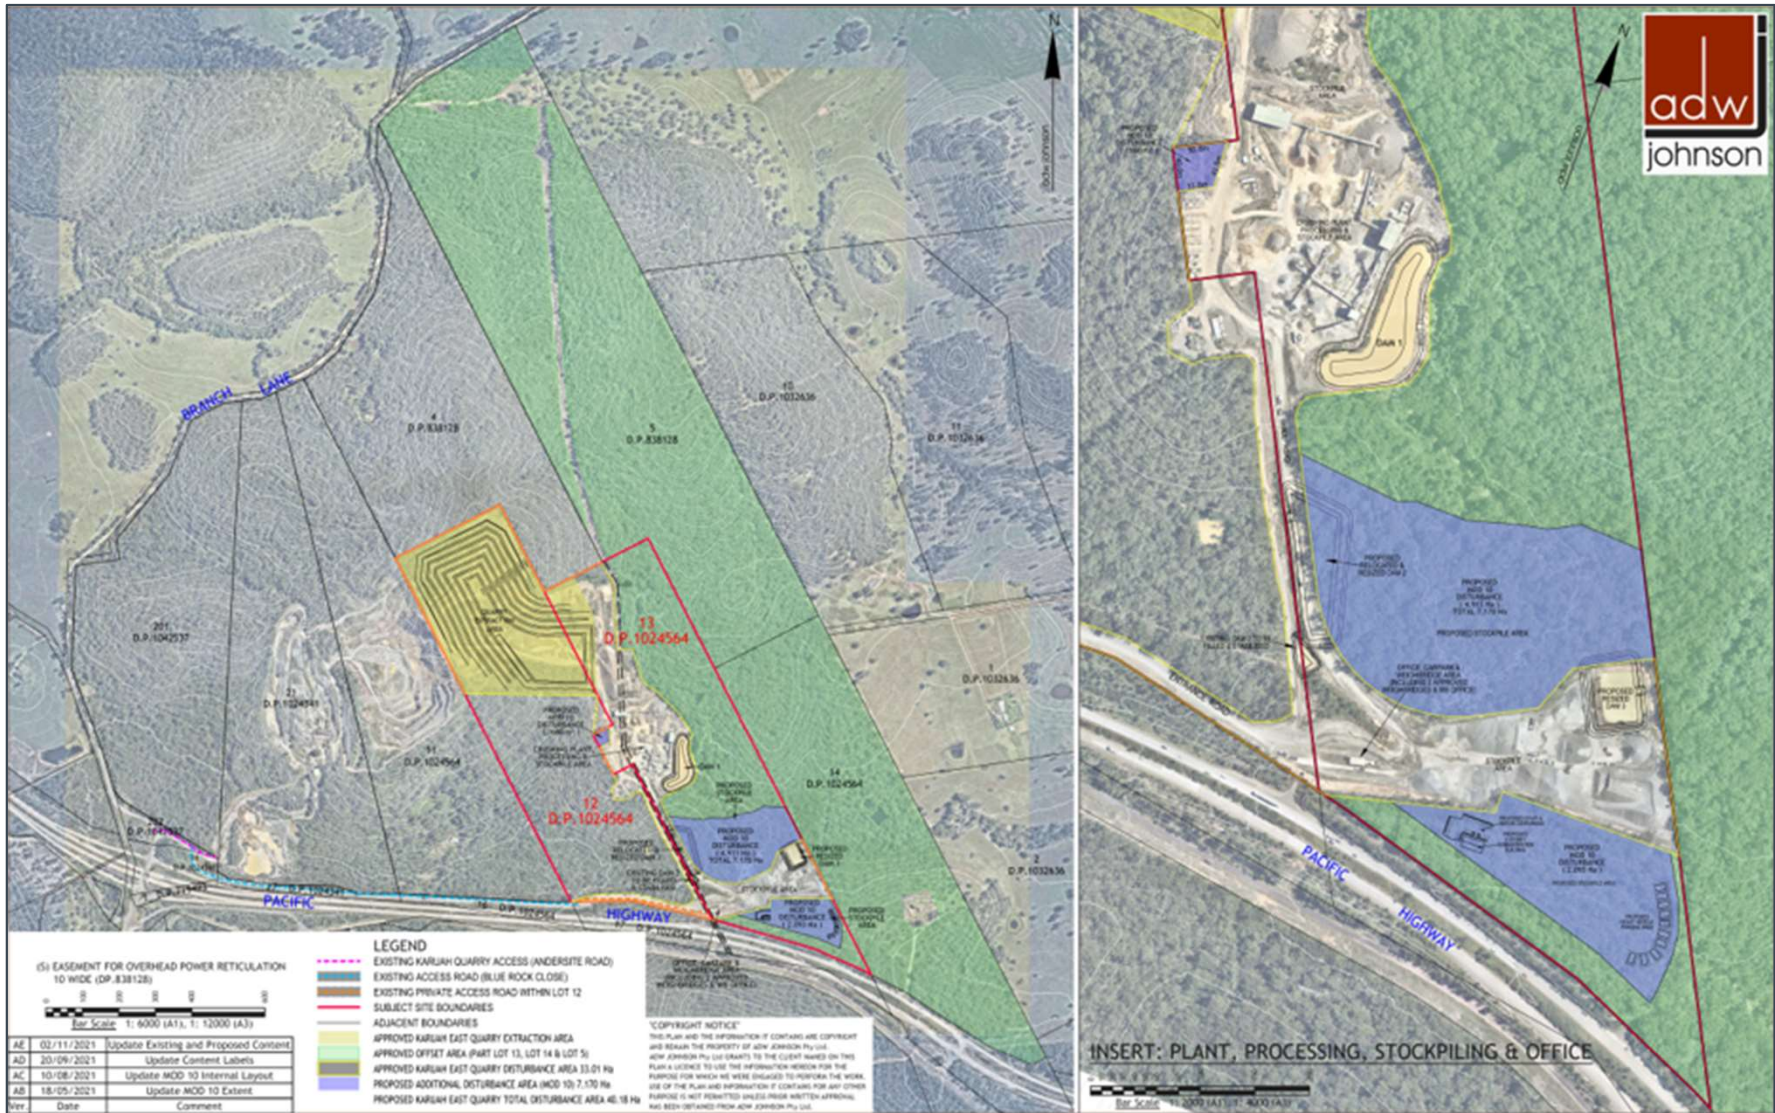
KEQ Proposed Modification 10 Plan [DRAFT]
